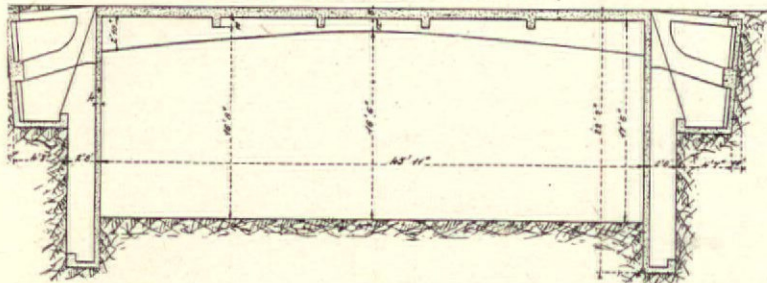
FIGURE XVIII. LONGITUDINAL SECTION OF BRIDGE OVER THE QUAI DEBILLY, PARIS.
